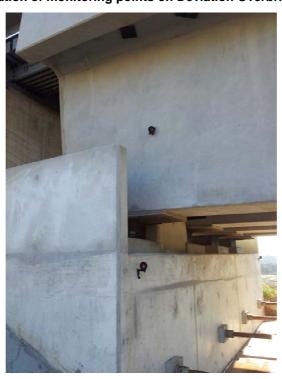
Survey prisms located on abutment and bridge deck of Deviation Overbridge at 92.400 km
